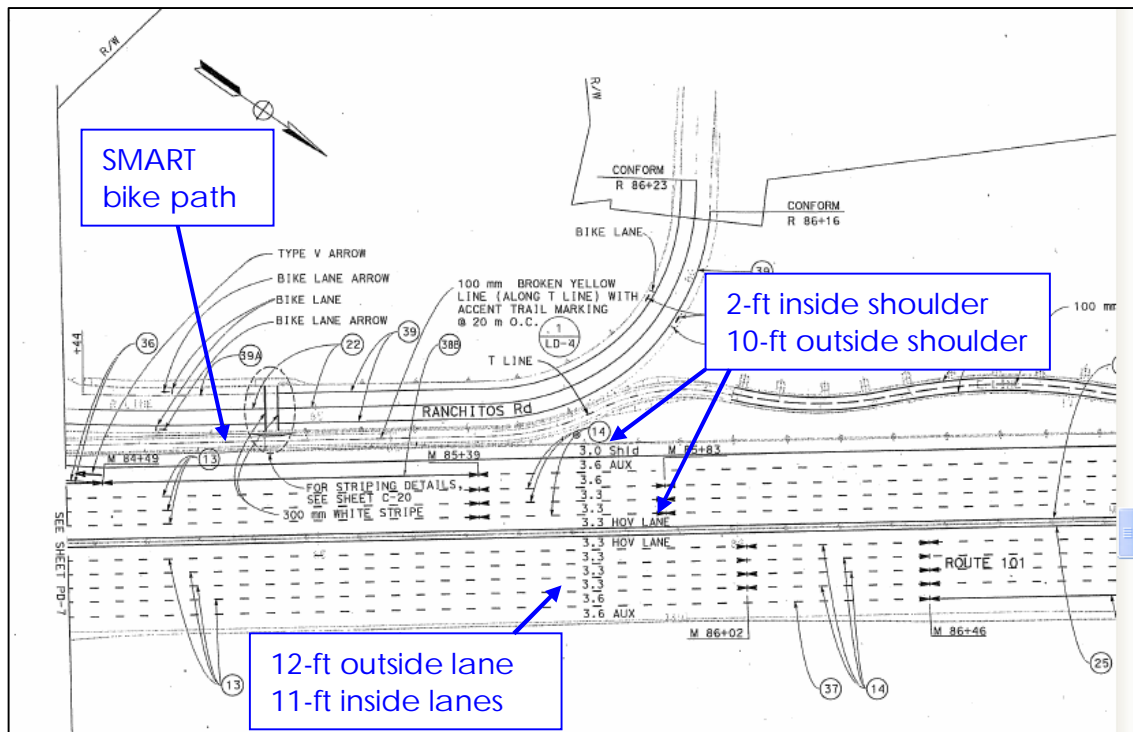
Portion of the Gap Closure Project Plan North of Lincoln Avenue
